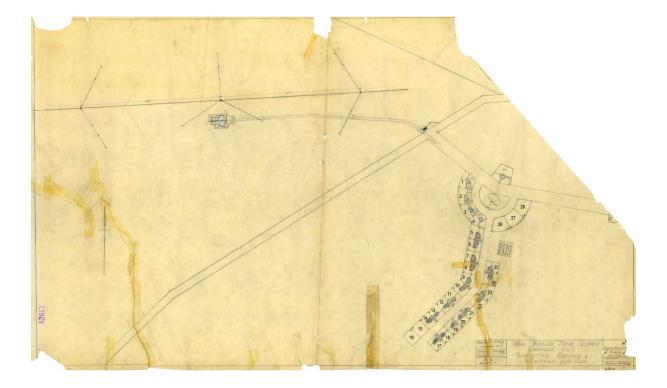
1939 'Naval Wireless Station Belconnen' transmitter, building and cottages site plan. (Source: National Archives of Australia, A2617, 7238860 with GML overlay)
